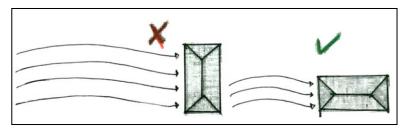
15: Building elevation towards wind Source: Prepared by author from IFRC (2011)
